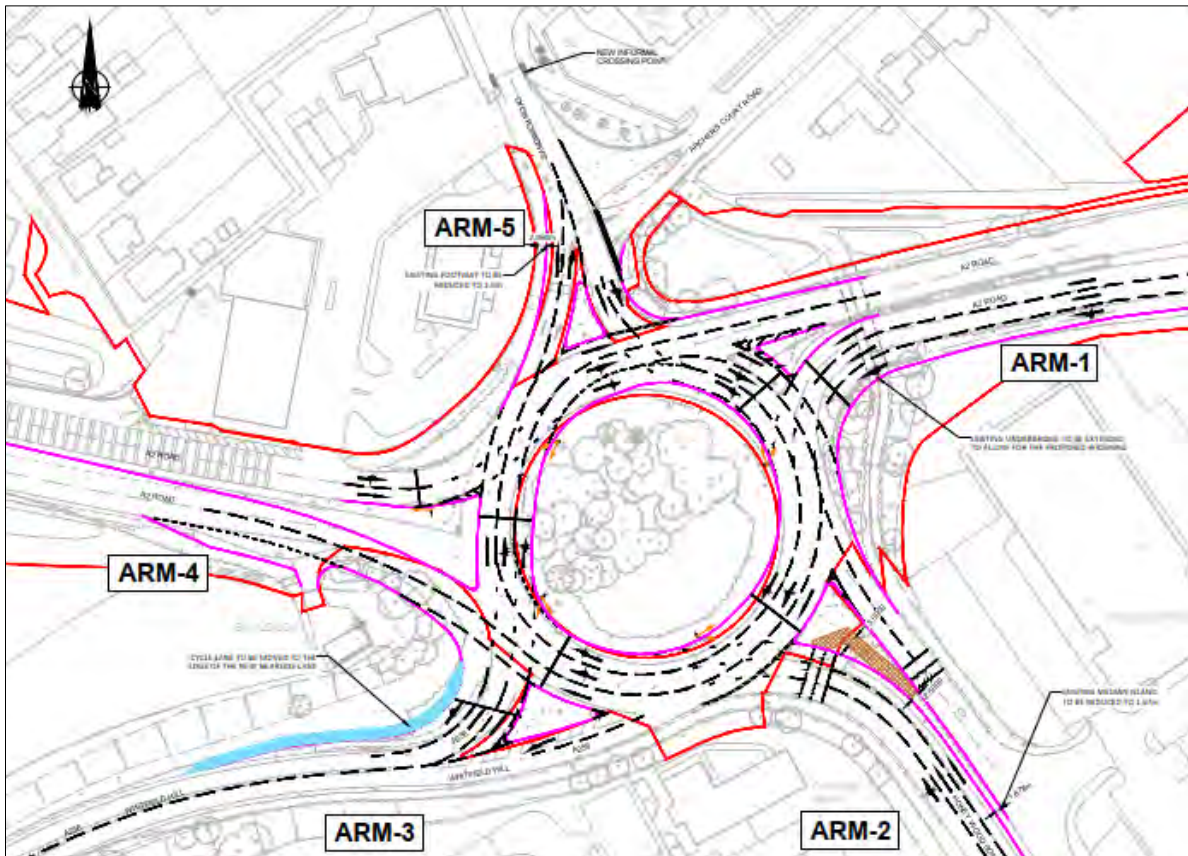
2D Geometry layout of Design of Whitfield Roundabout
